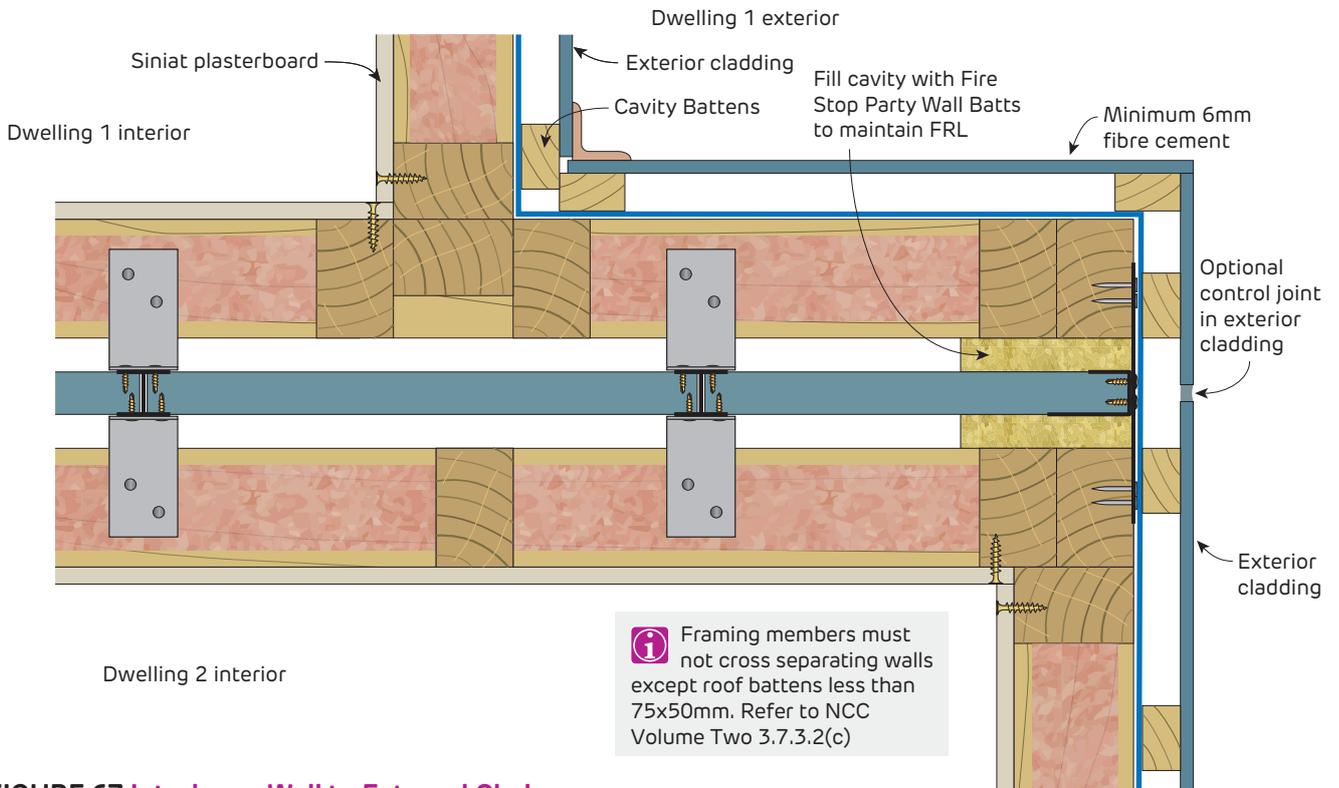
Interhome Wall to External Clad Wall with Cavity battens with Return
